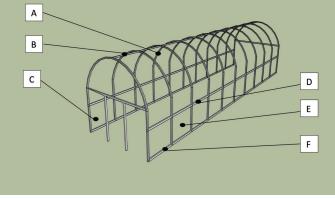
An example of a high tunnel structure. A. Rib, hoop, arch, bow; B. Ridgepole or purlin; C. End wall; D. Hip board; E. Side wall; F. Baseboard.
